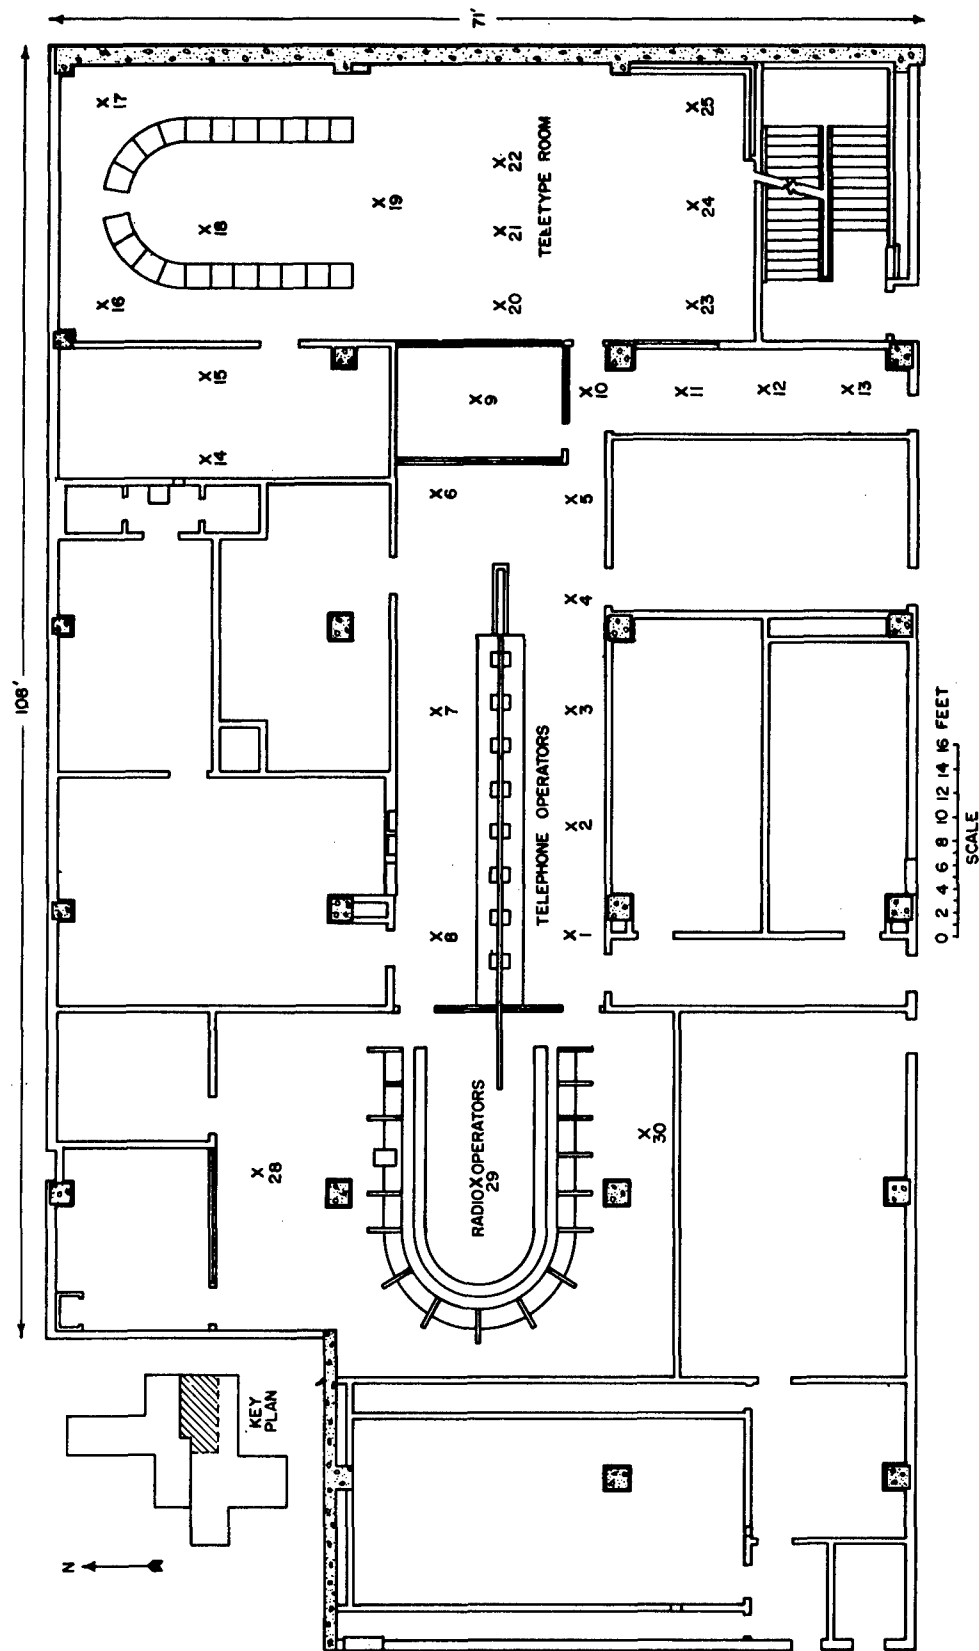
Floor plan of communications section of Los Angeles Police Department building showing detector positions.
